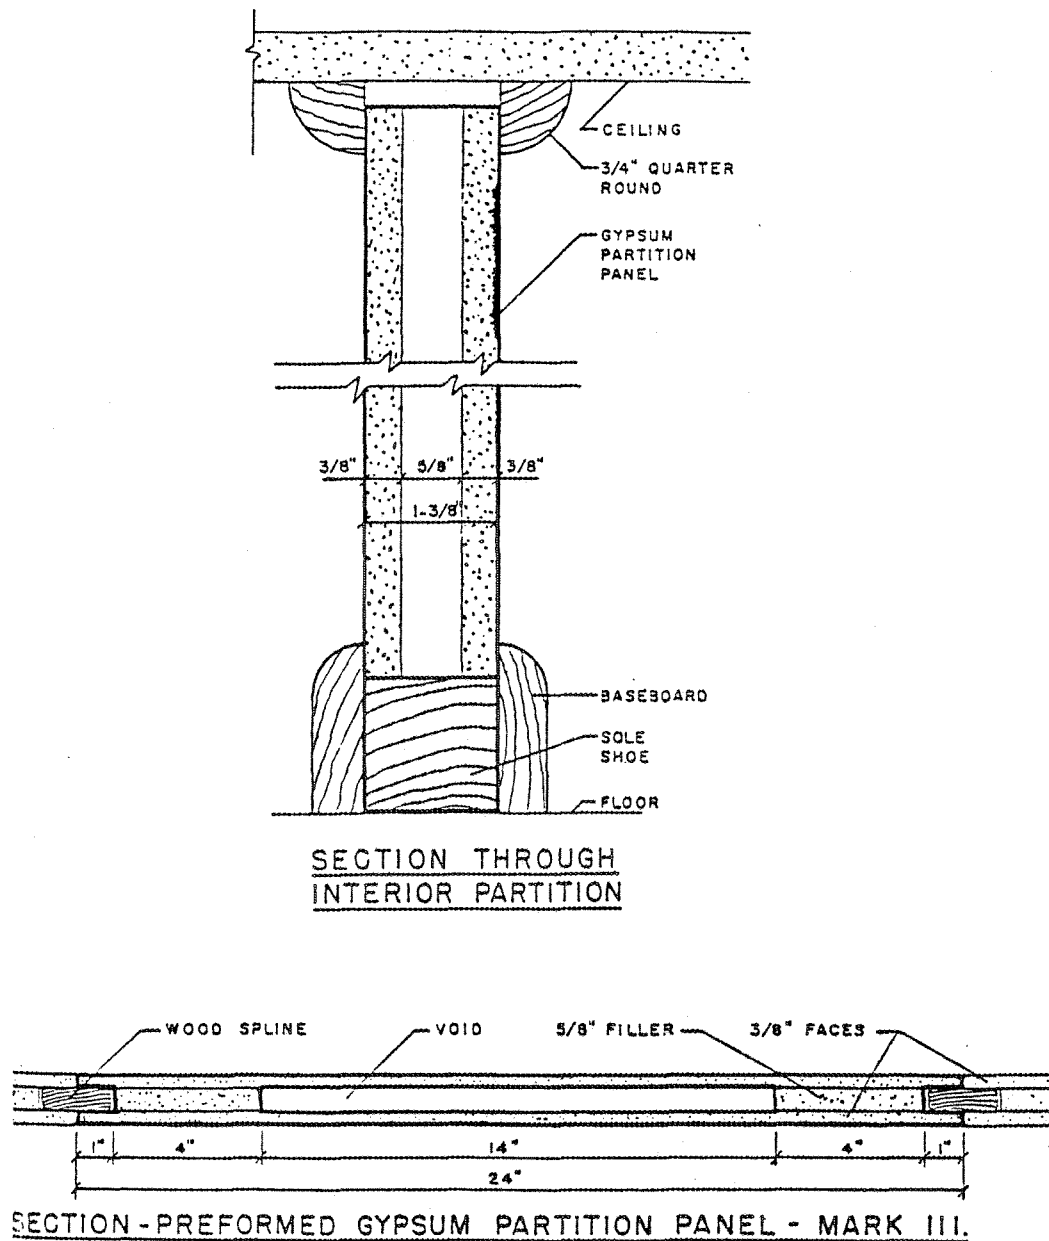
This drawing shows how the interior wall panels were constructed in the Mark III house.
